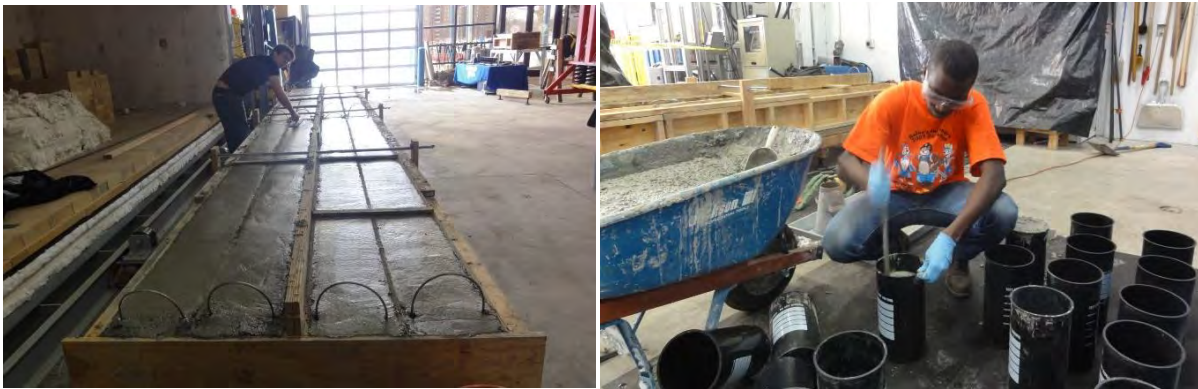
Completed beams and preparing concrete cylinders for uniaxial testing
